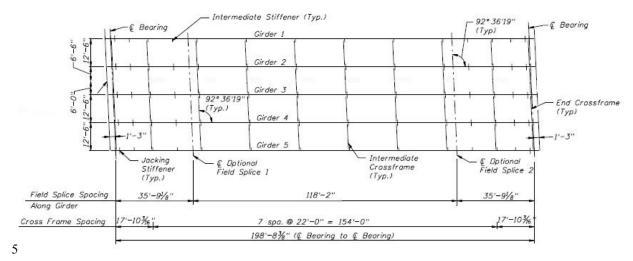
Framing plan of the I-95 Bridge over SR-421
